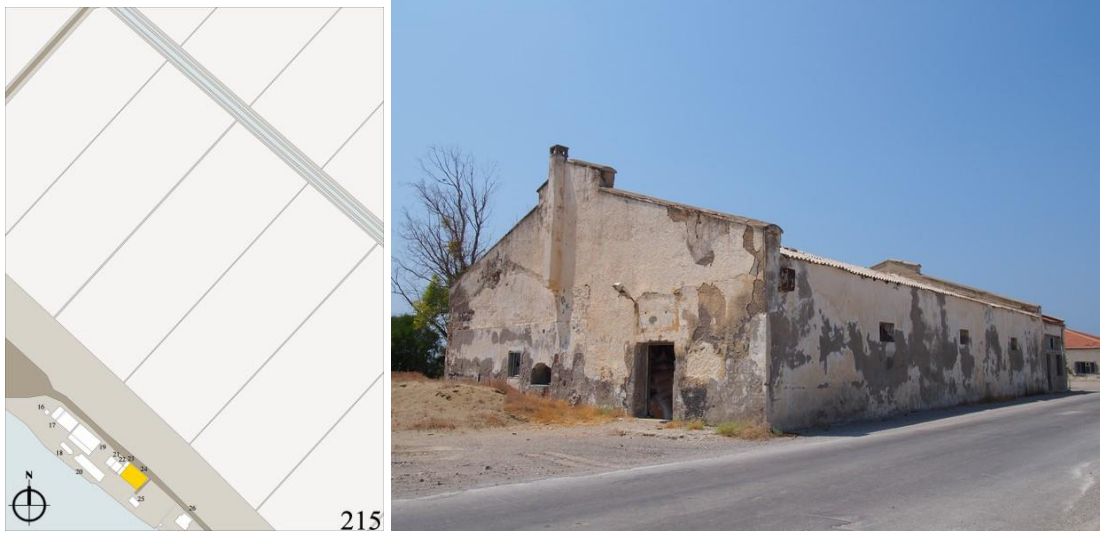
Site plan and view from the eastern corner of the cinema (Author, April 2016)
